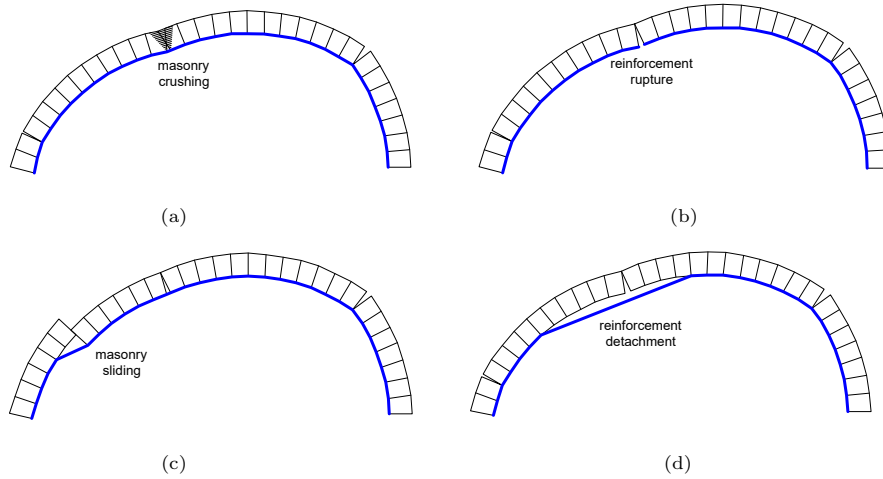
Feasible failure modes of masonry arches reinforced with composites: masonry crushing (a), reinforcement rupture (b), masonry sliding (c) and reinforcement detachment (d).
